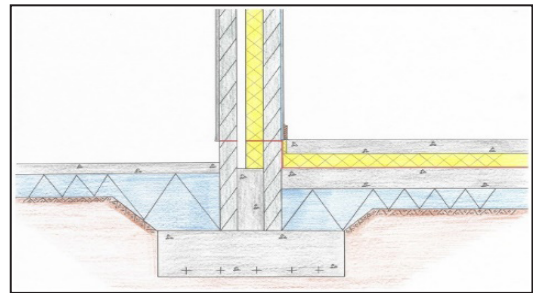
Strip Foundation for Timber Structure (Colm, 2013)
